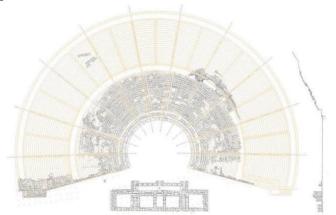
Plan & Section of the A' Theatre of Larissa.
